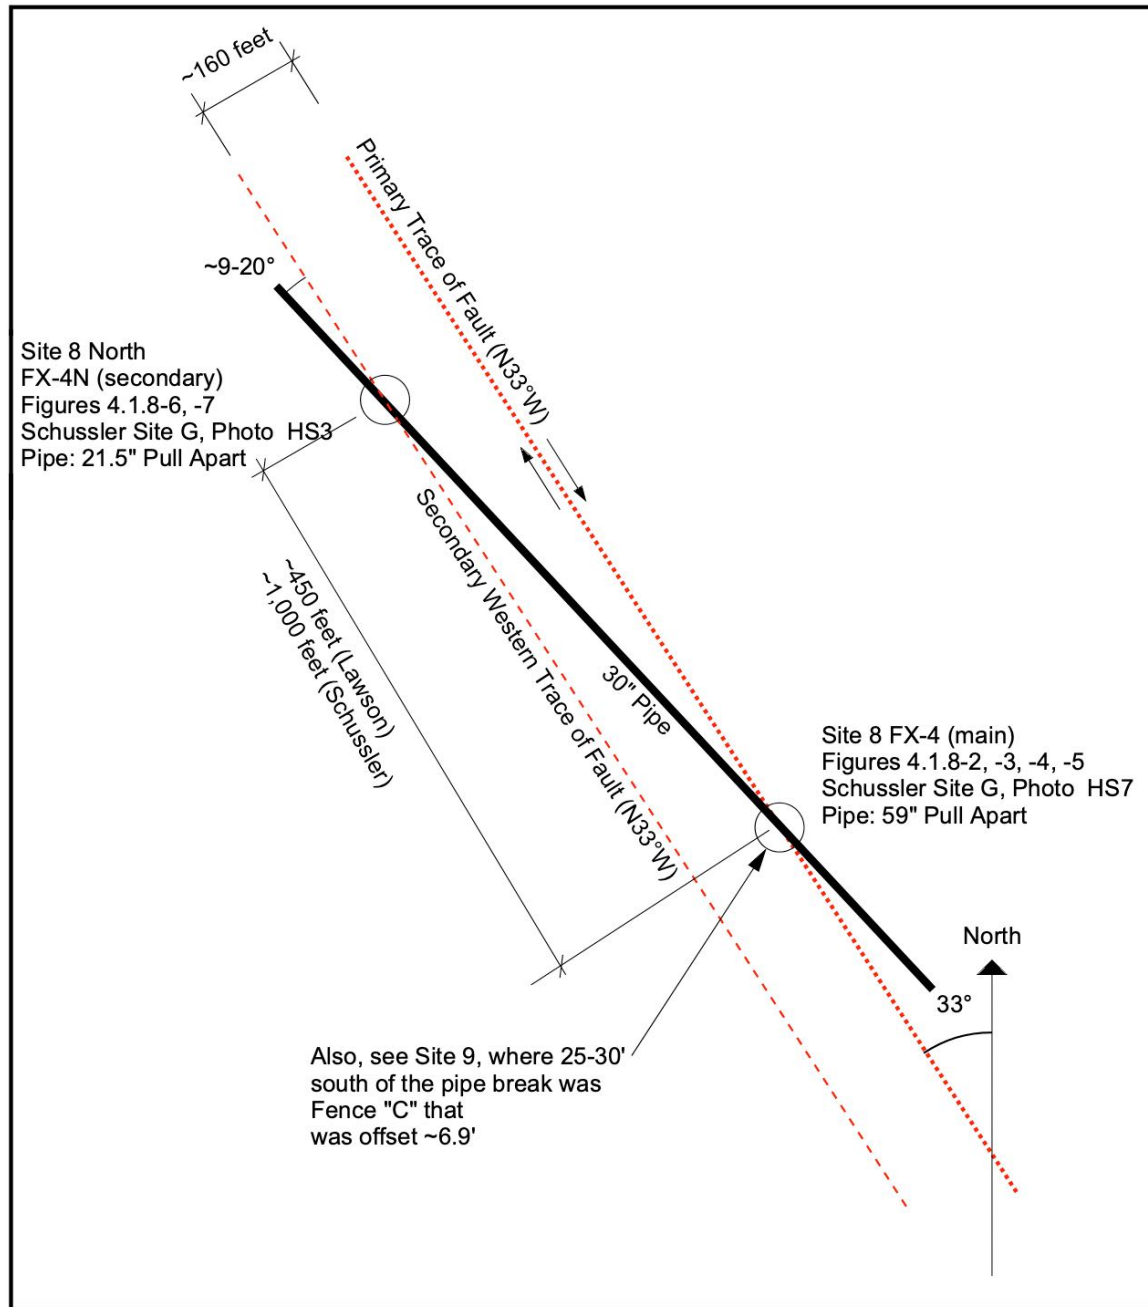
FX-4, FX-4N. Orientation of the Pipe, Fault and Pipe failures at Site 8
